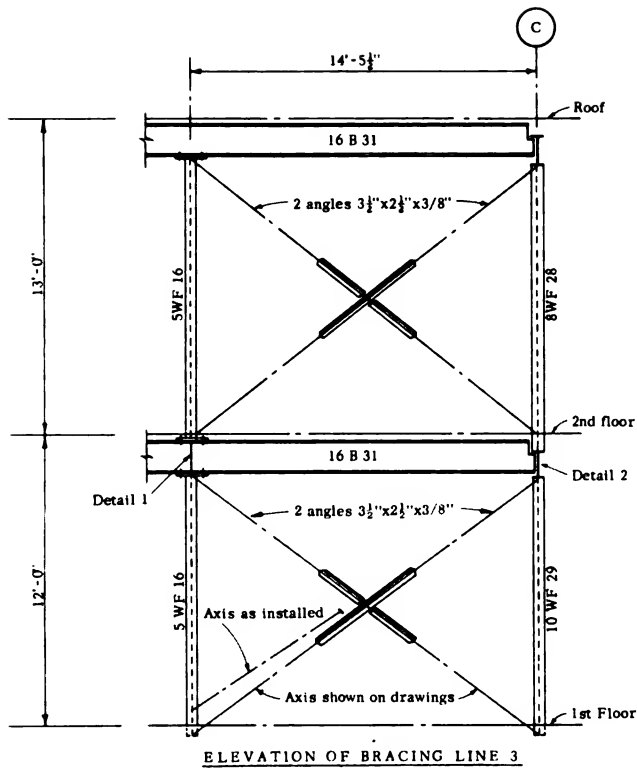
Foothill Medical Center. Bracing elevations and details.
